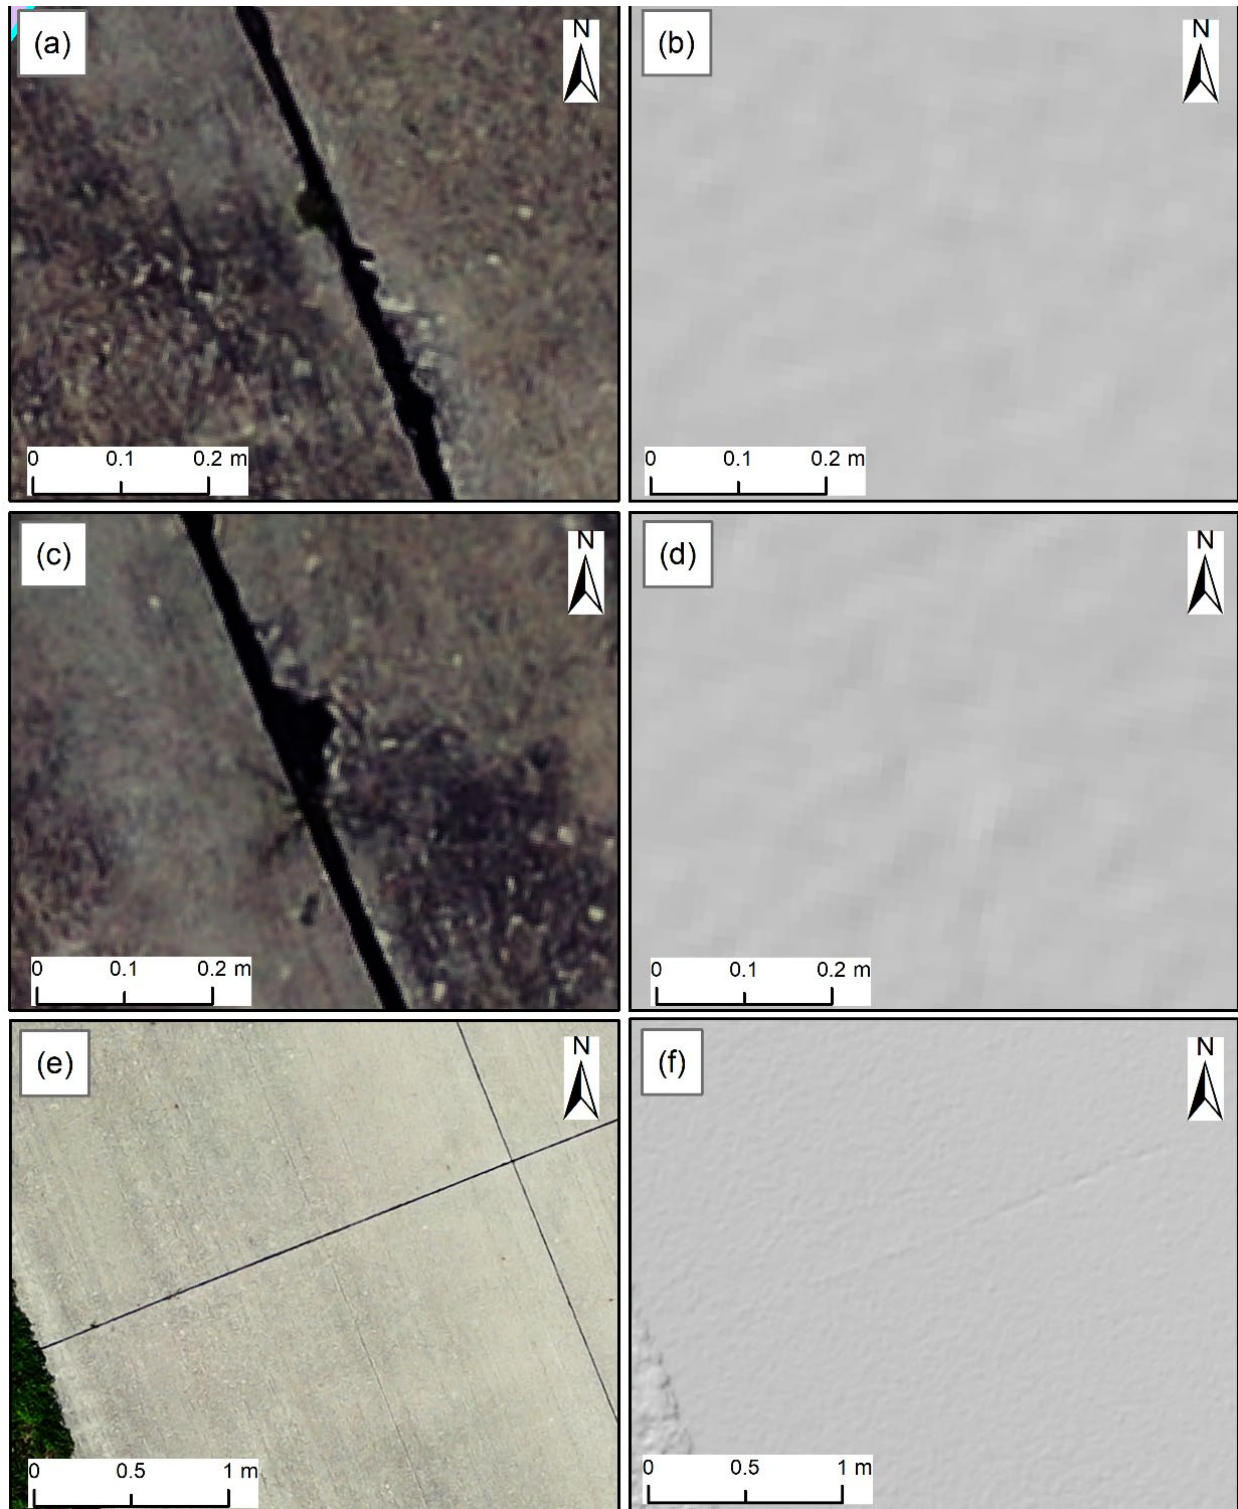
Joint Spalling (L) in (a) 3.3-mm/pix Orthophoto and (b) 13.5-mm/pix DEM; Joint Spalling (M) in (c) 3.3-mm/pix Orthophoto and (d) 13.5-mm/pix DEM; and Joint Seal Damage (M) in (e) 2.4-mm/pix Orthophoto and (f) 9.5-mm/pix DEM
